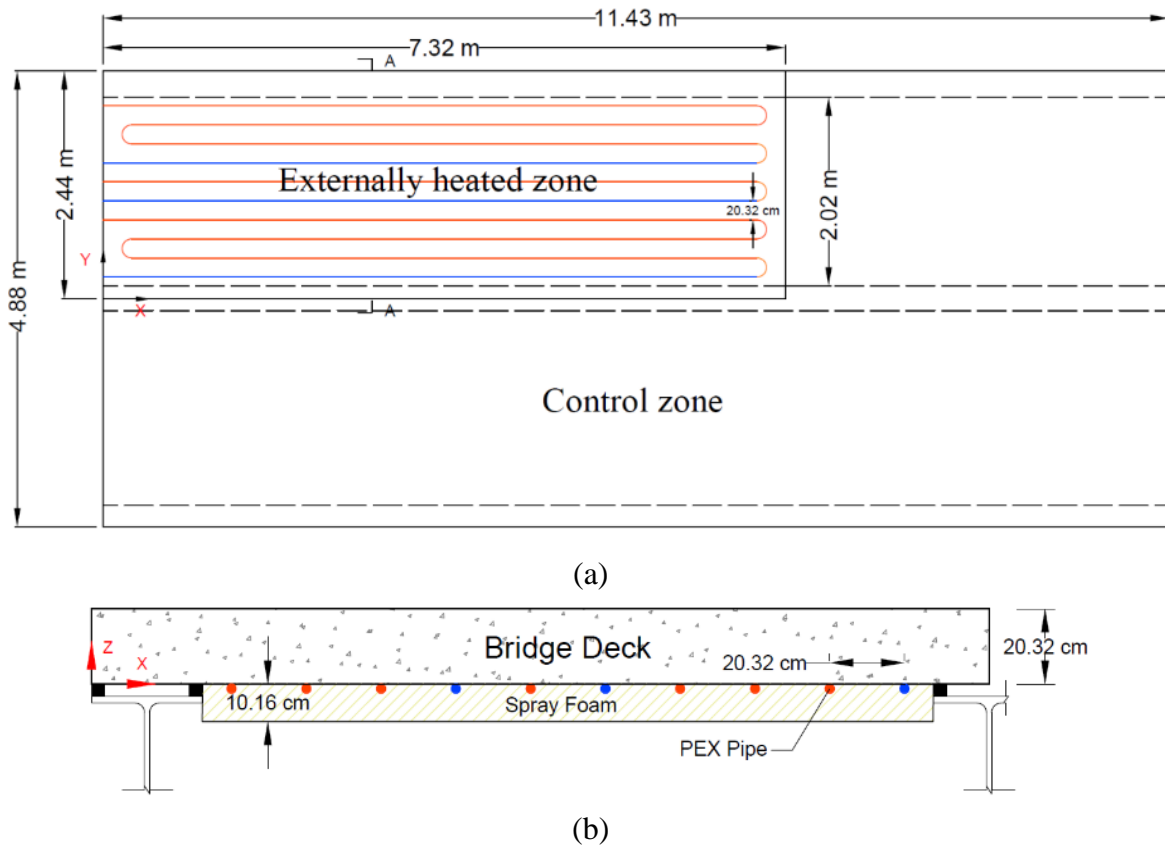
The design of the mock-up bridge deck: (a) Plan view of the bridge deck, (b) Cross-sectional view of the bridge deck
